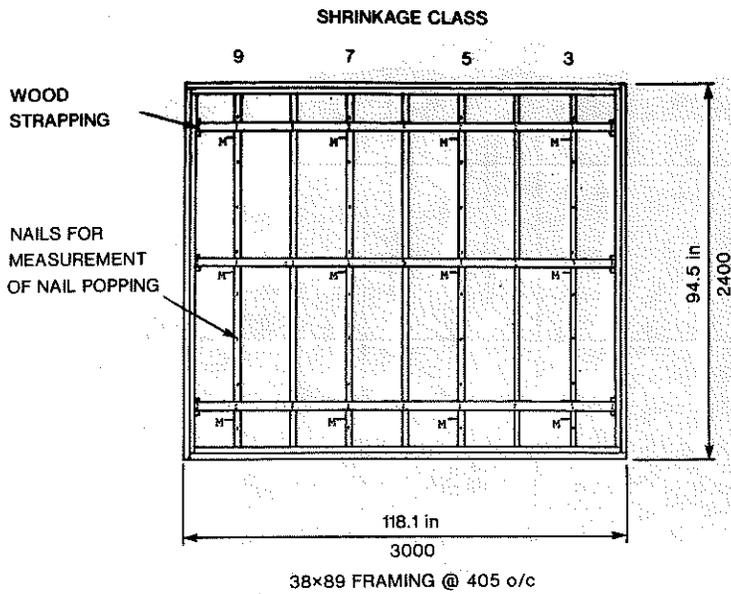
Elevation of a typical test wall showing framing layout and location of nails for nail popping measurements
